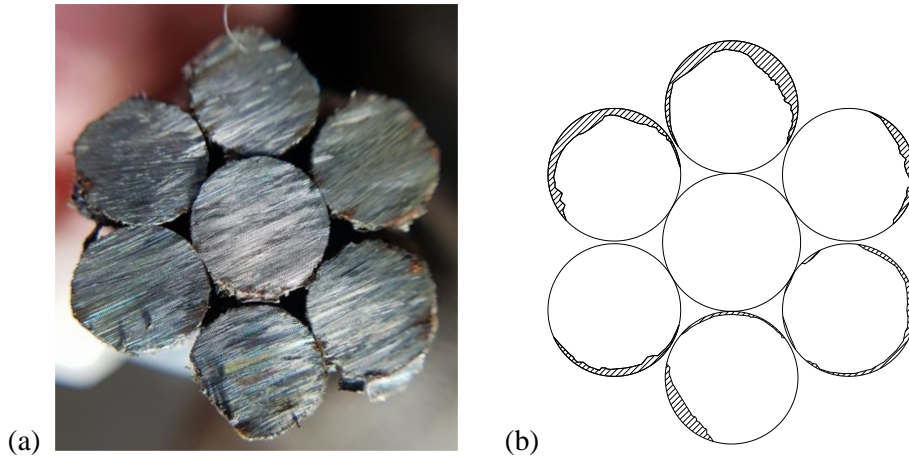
Cross-section of a corroded strand: (a) photograph of a corroded strand section; and (b) identified cross-section.
